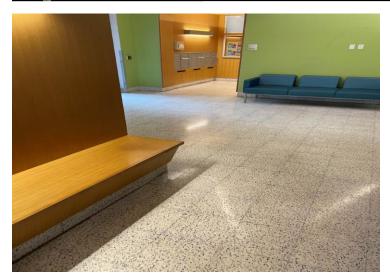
Interior floor within 1<sup>st</sup> floor of the Borinquen Court building, facing west.
